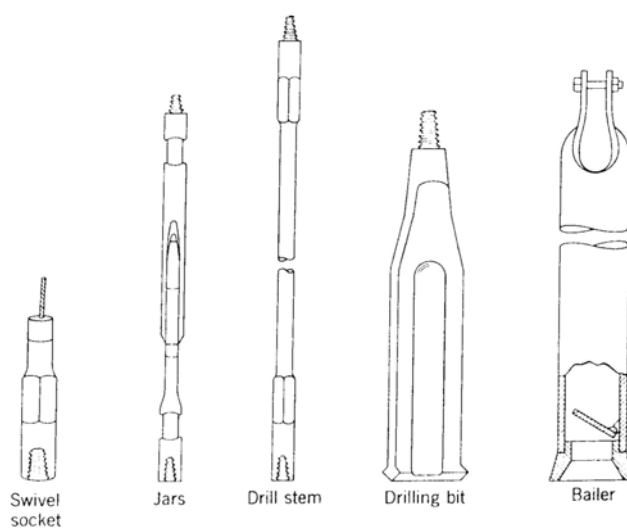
Basic Well Drilling Tools for the Cable Tool Method
